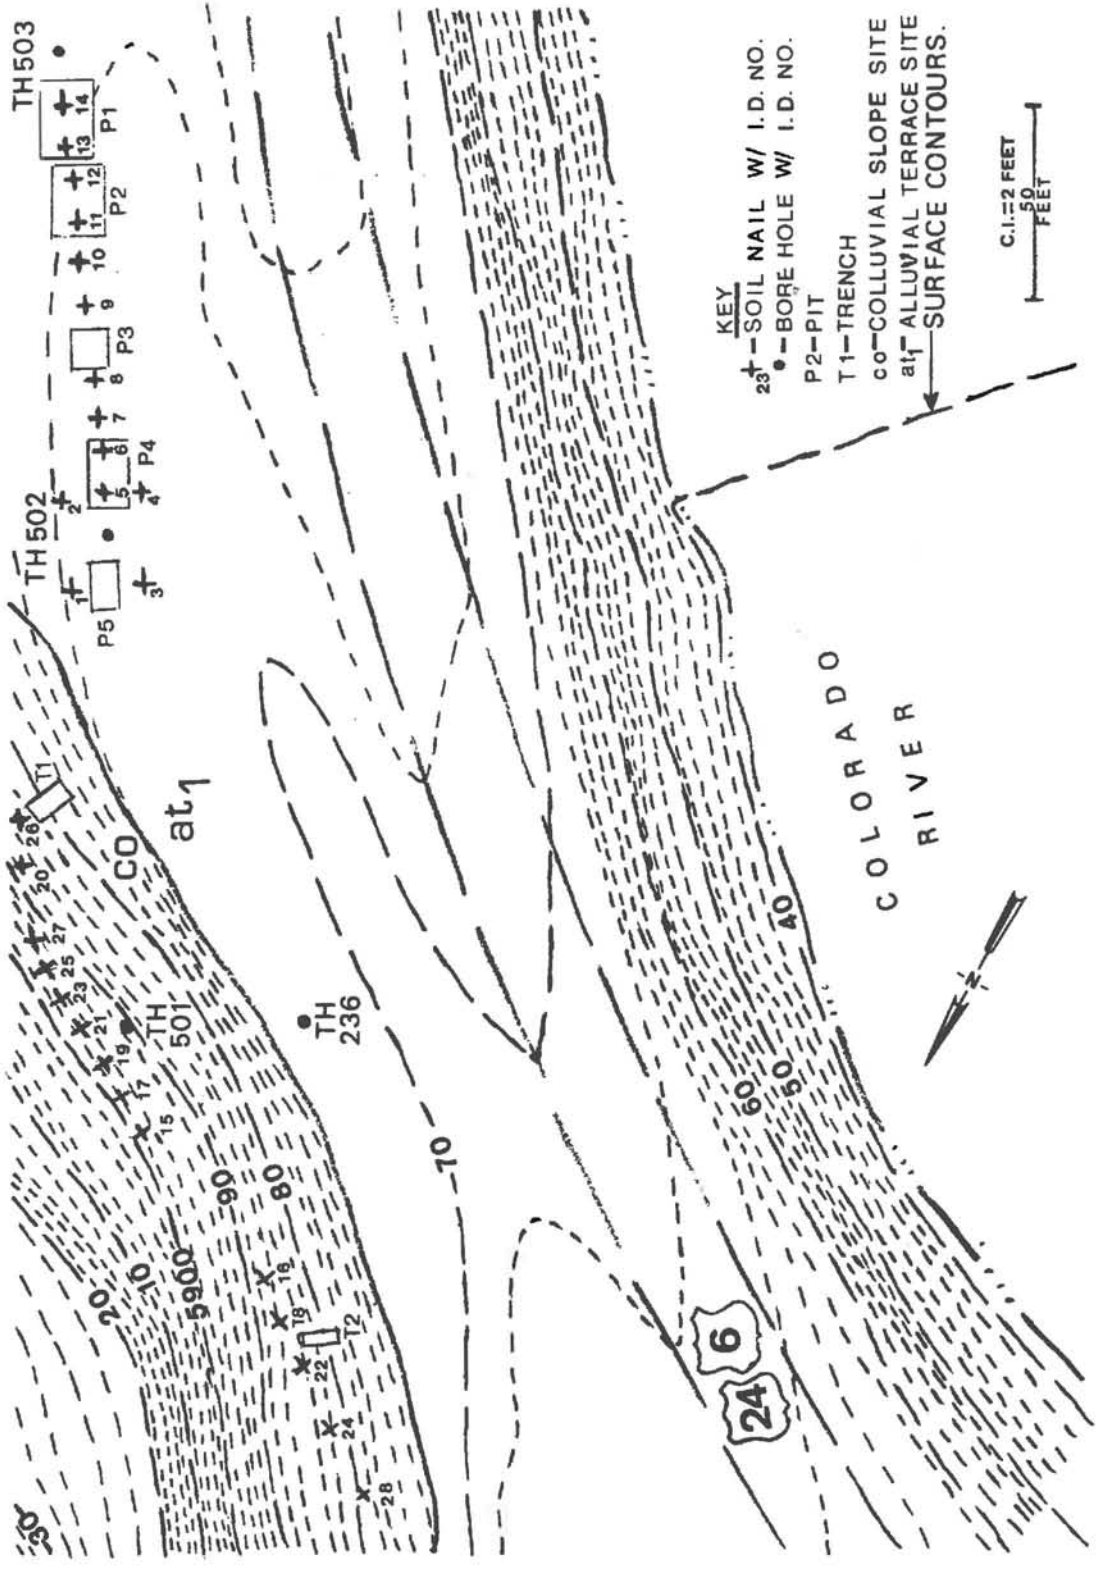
TEST PITS & TRENCHES RELATIVE TO EMBEDDED SOIL NAILS.
